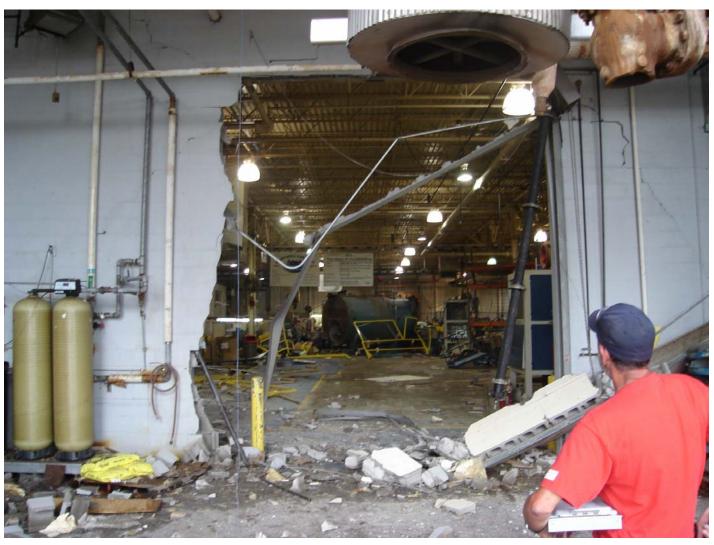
Hole Created by Boiler through Roll Up Door Wall (West Wall)
